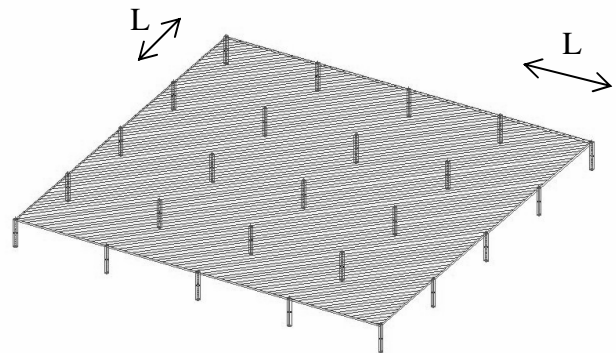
Slab type 6, Inner field of indefinite girderless floor.
